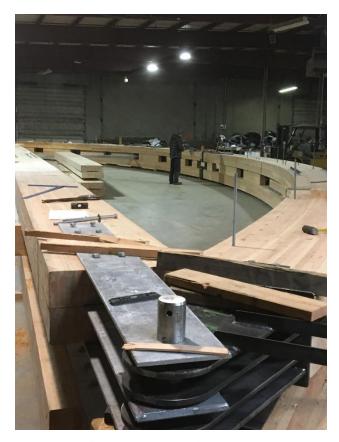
The timber components were preassembled prior to preservative treatment to ensure a proper fit and minimize on-site modifications.
